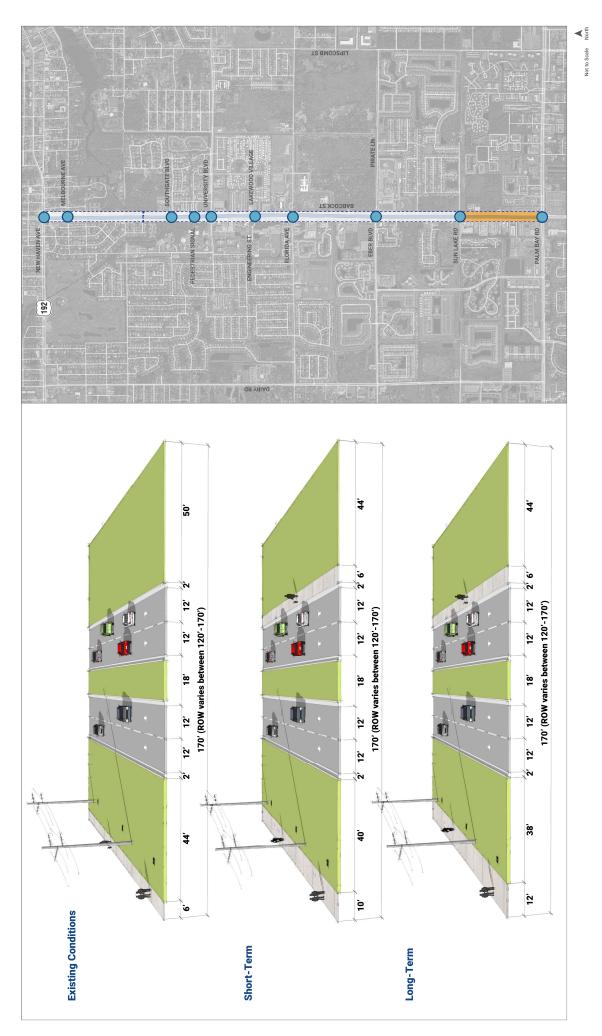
| Palm Bay Road to Sun Lake Road Typical Section
